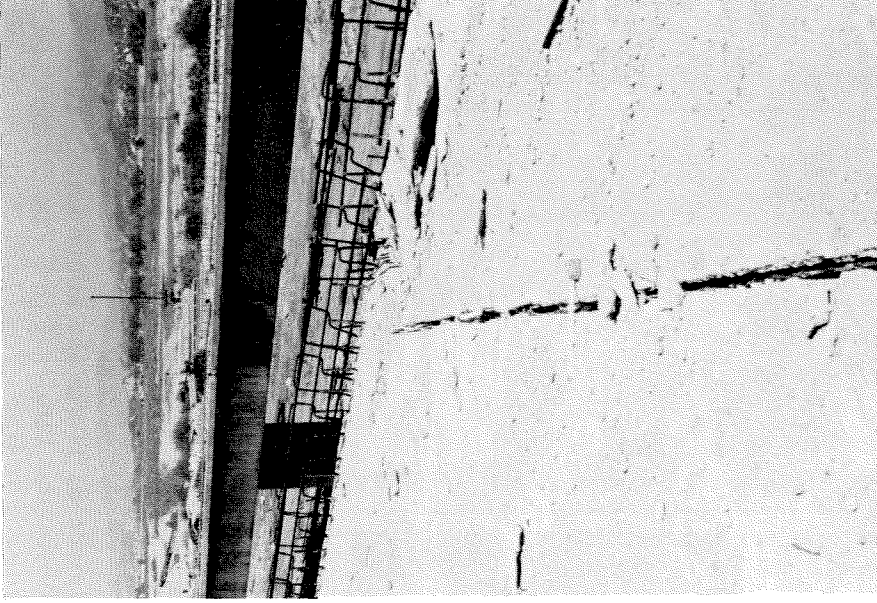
99 Pounding damage at a girder joint of one of the Santa Clara River bridges, Antelope Valley freeway.
